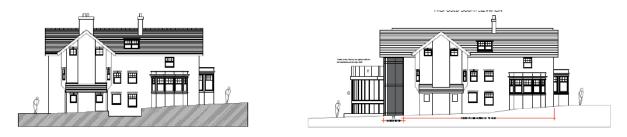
Existing and Proposed Northern Elevation plan extract comparison
